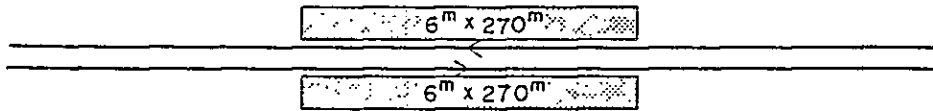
Sketch of Track Layout at Stations with Elevated Tracks
